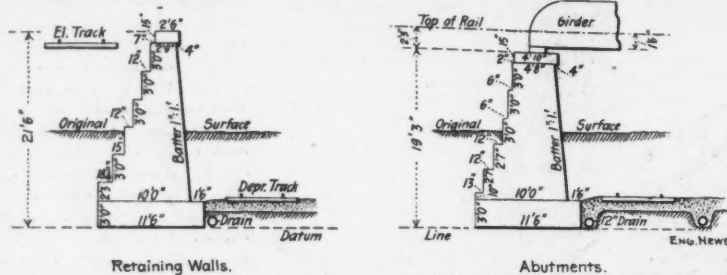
TYPICAL SECTIONS FOR RETAINING WALLS AND ABUTMENTS, 16TH AND CLARK STREETS GRADE CROSSING WORK.
